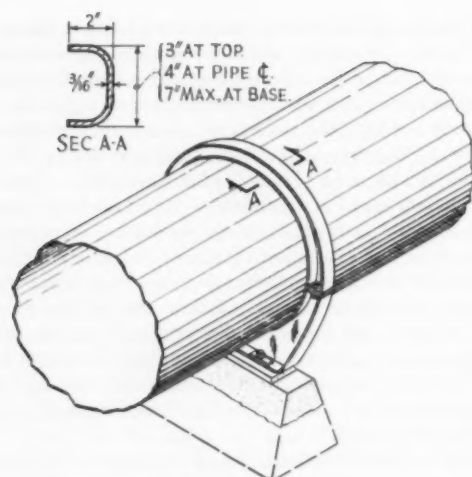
PRESSED-STEEL RING-GIRDER SUPPORT FOR 30-IN.-DIAM PIPE LINE
